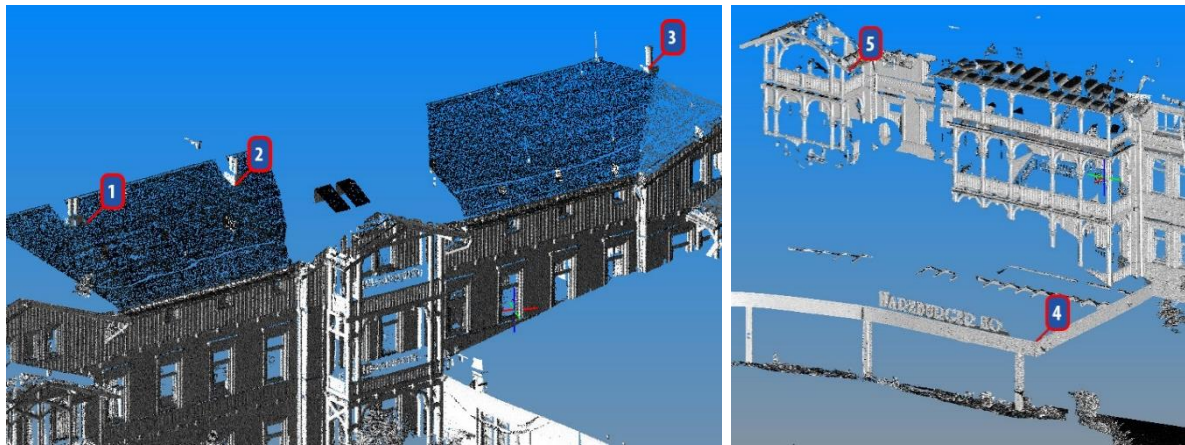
Points 1, 2, 3 on L1. Vertices of chimney masonry (left). Points 4 and 5 on L1. Vertex of garage wall (point 4) and of roof (point 5) (right).
